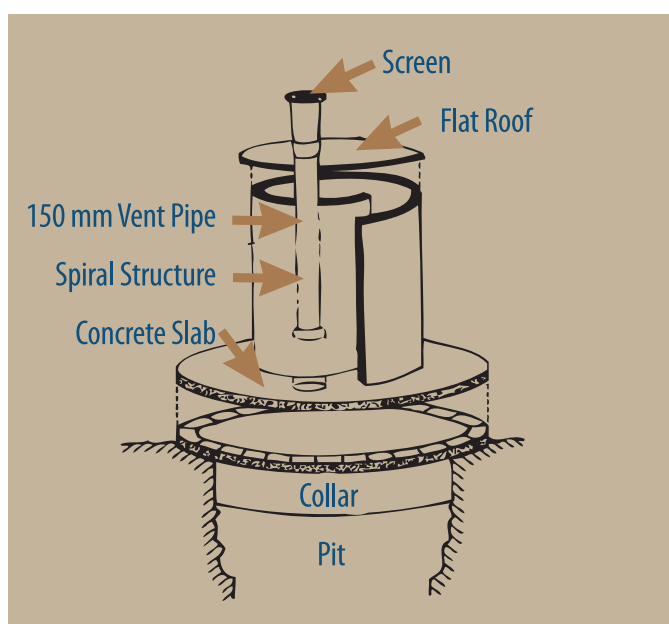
Ventilated Improved Pit (VIP) ferrocement toilet. The spiral walls afford some privacy to users even without a door. The entrance faces the prevailing wind to enhance ventilation, and a big air vent conducts pit odors away from the room. Source: *Basic Sanitation and Human Excreta Disposal in Latrines*. GTZ.
